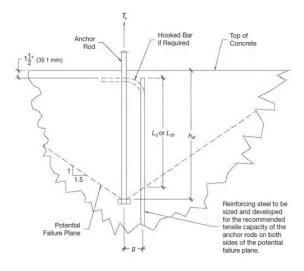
The use of steel reinforcement for in thin slab developing anchor rods [6]
